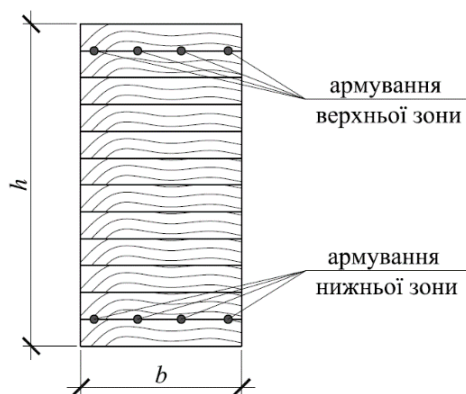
Cross section of the arrow arch of glued wood, reinforced with composite reinforcement
